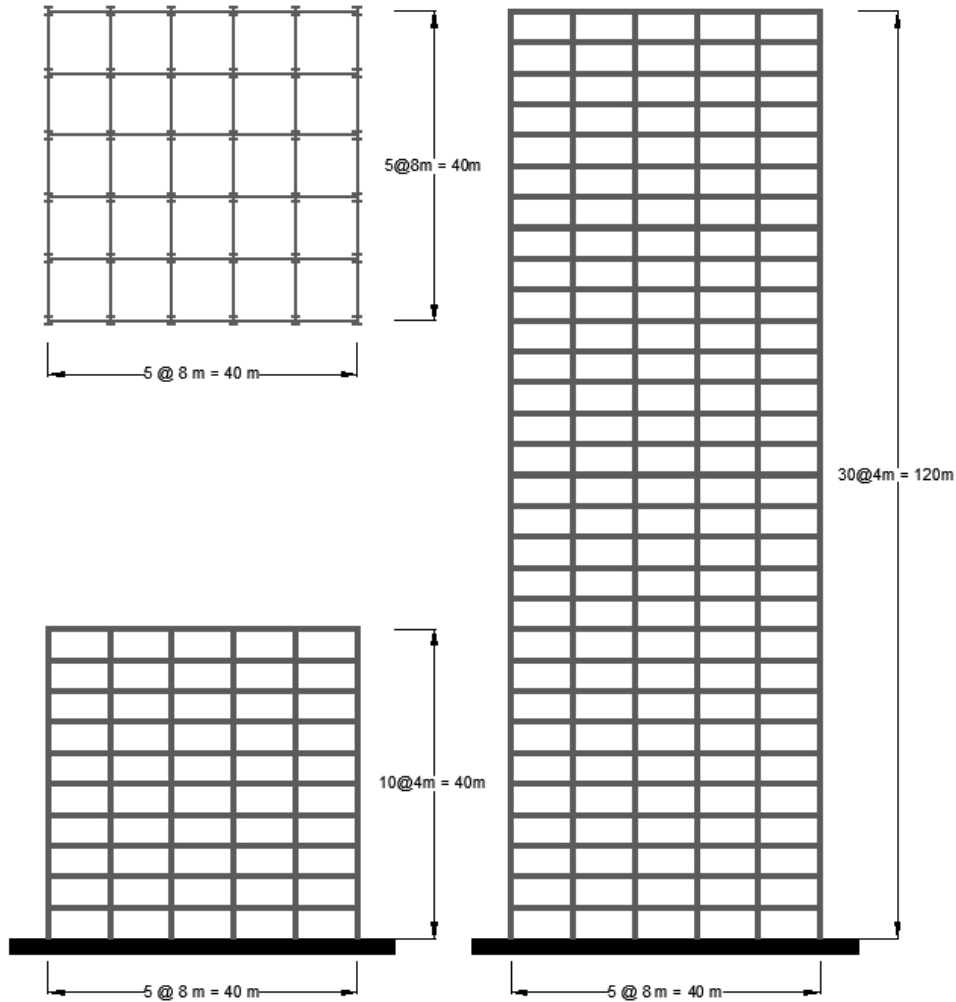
Plan and Elevations of BM-10 and BM-30
